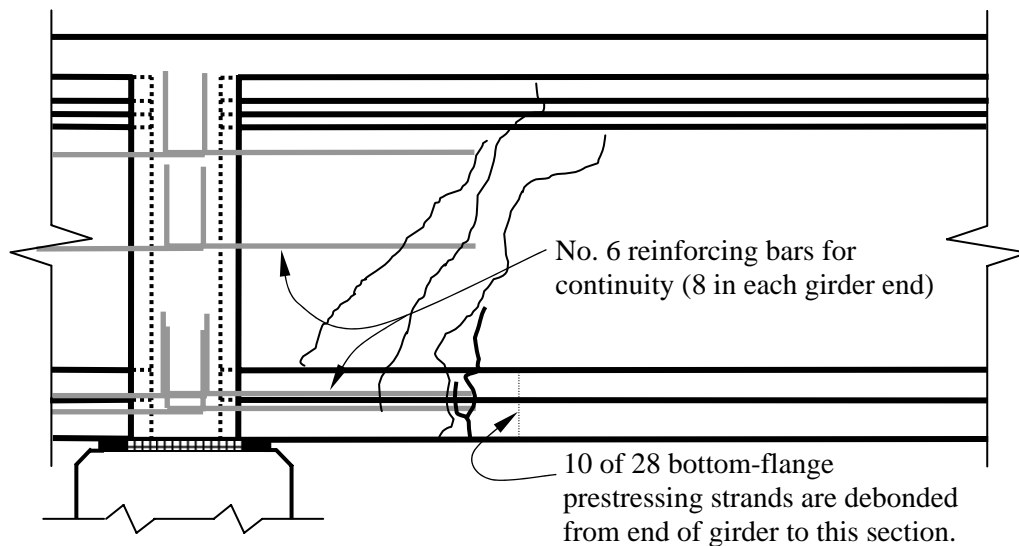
Cracked Girder with Continuity Reinforcement Details (Barnes et al. 2006)
